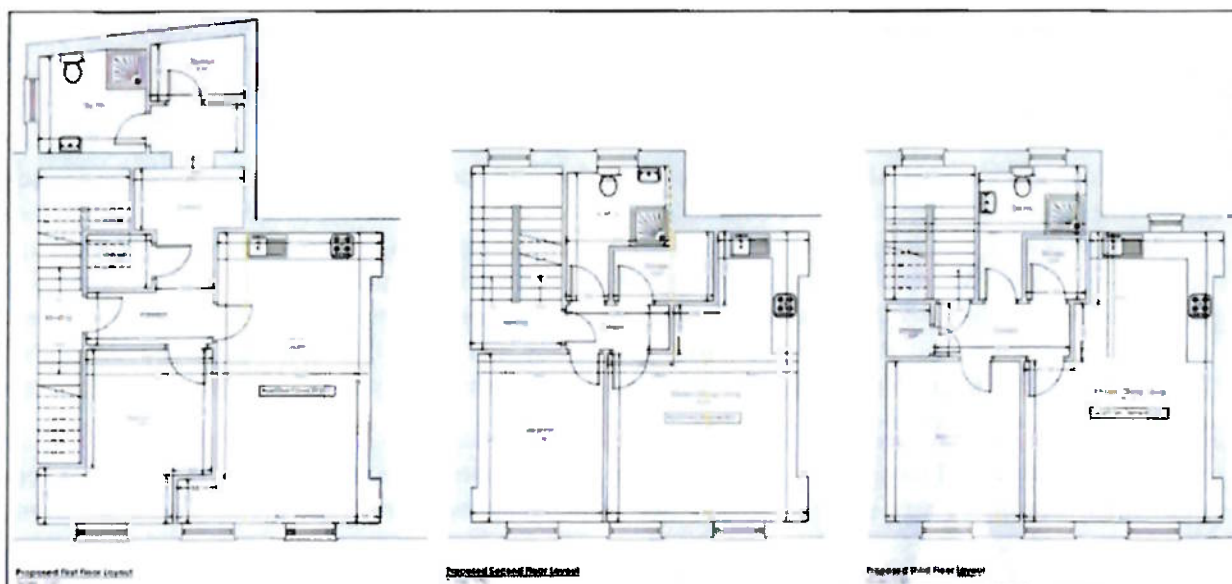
Proposed floor layouts for the first, second and third floors of 35 Cornmarket Street
